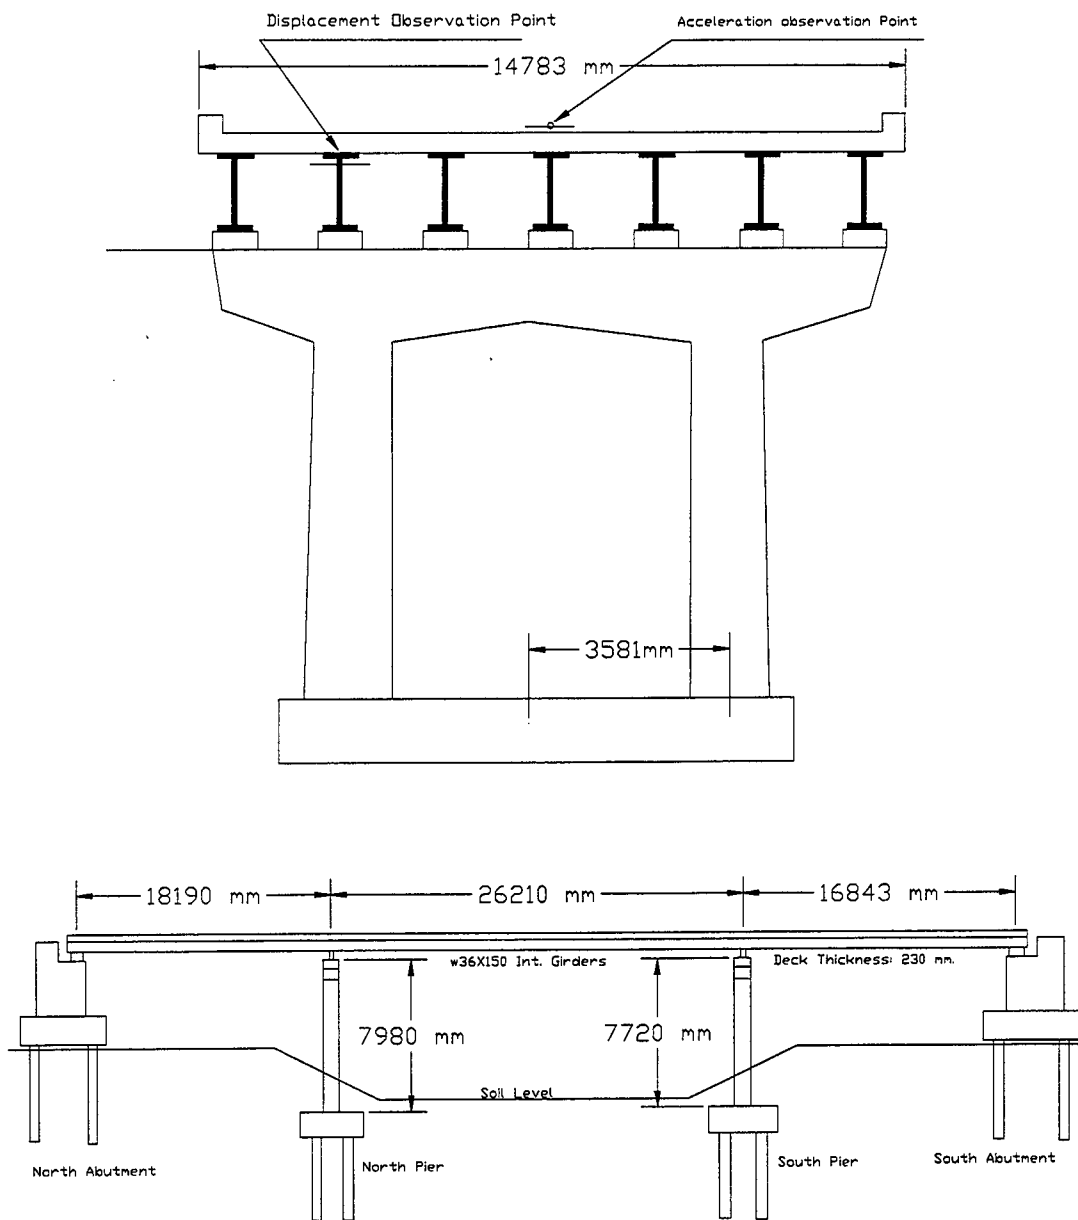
Plan and Side Views of Cazenovia Creek Bridge in New York State
